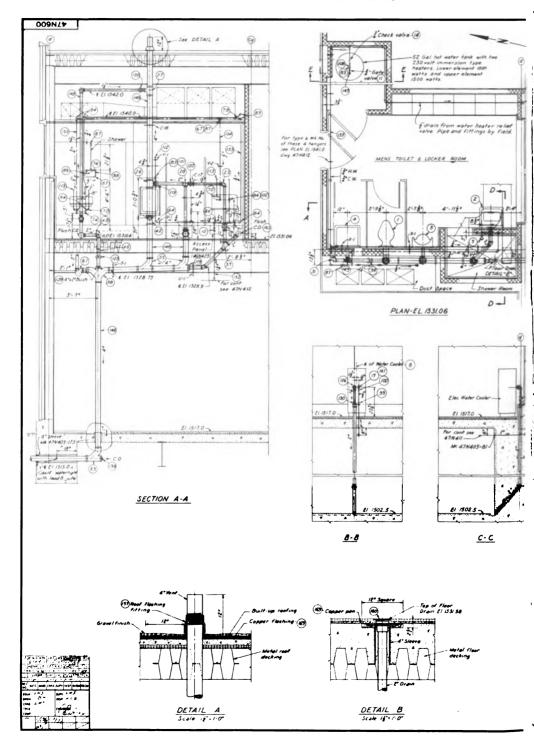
illustrates a typical powerhouse plumbing design drawing from which the actual installation is constructed. Plate 35 is a similar design drawing of the isometric type prepared for a con-
